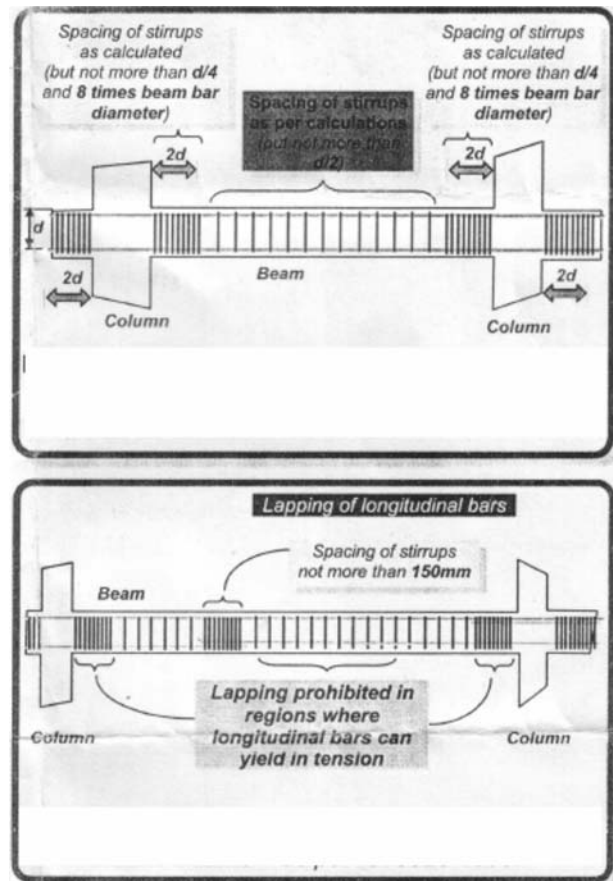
Drawing of reinforcement setup at beam, column and Joint [10].
